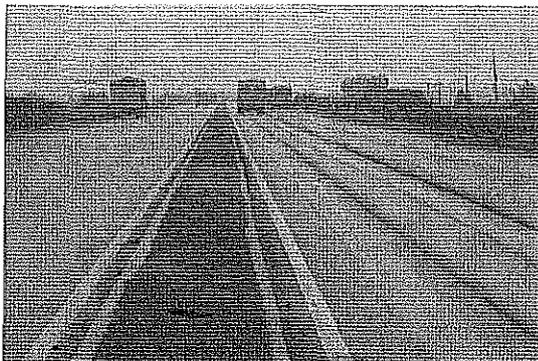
A typical pavement settlement failure of the NH-2, Varanasi
